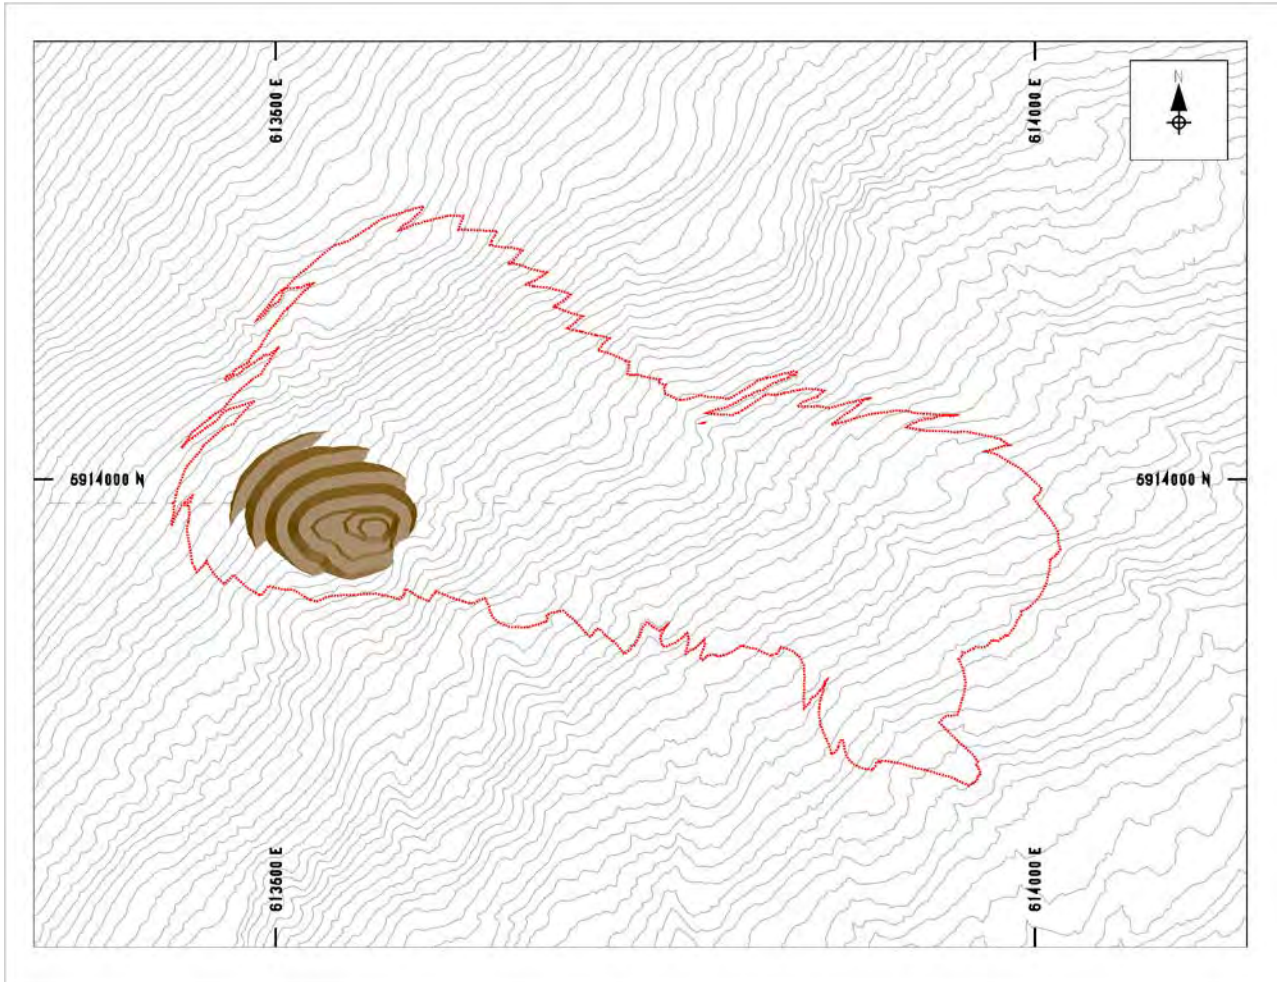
Plan View of Starter Pit D651 with the Pit Limit Outline
